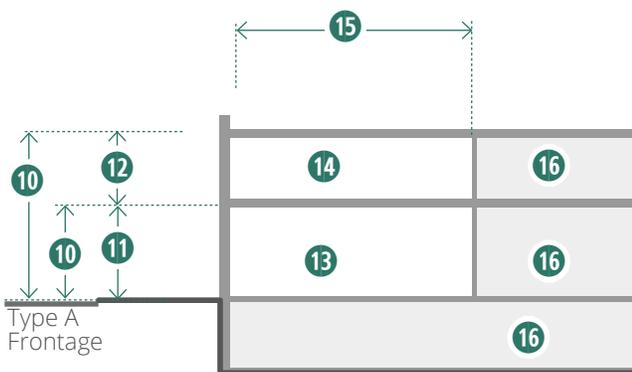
(6). Commercial Storefront Building Section: Height & Use Requirements
